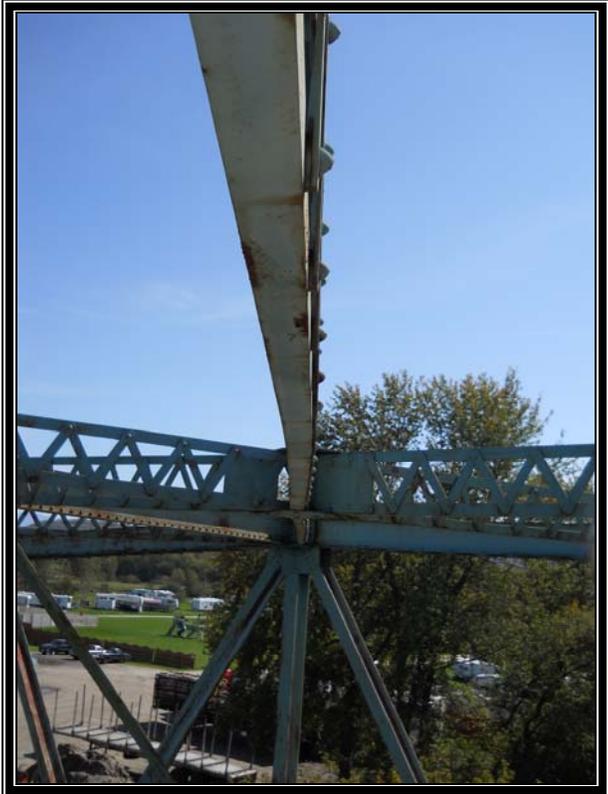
Span 2 Lateral Bracing Member U5S-U4N
